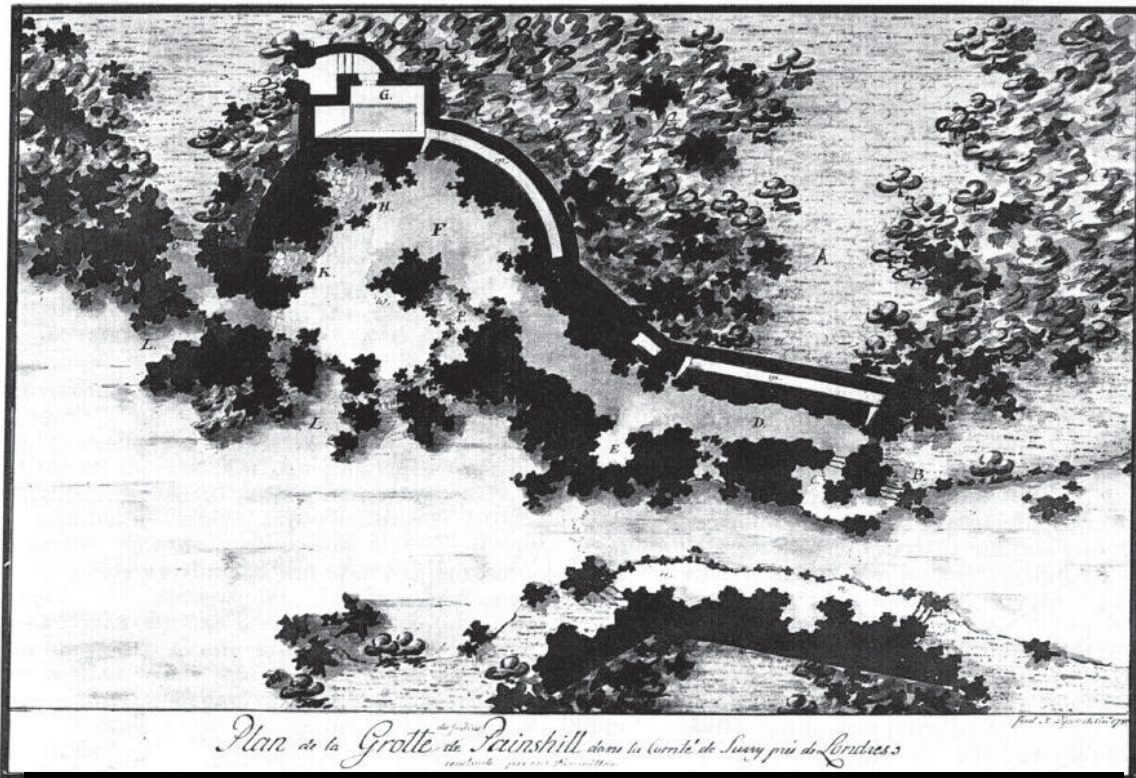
Plan of the Grotto at Painshill by F M Piper, 1779
